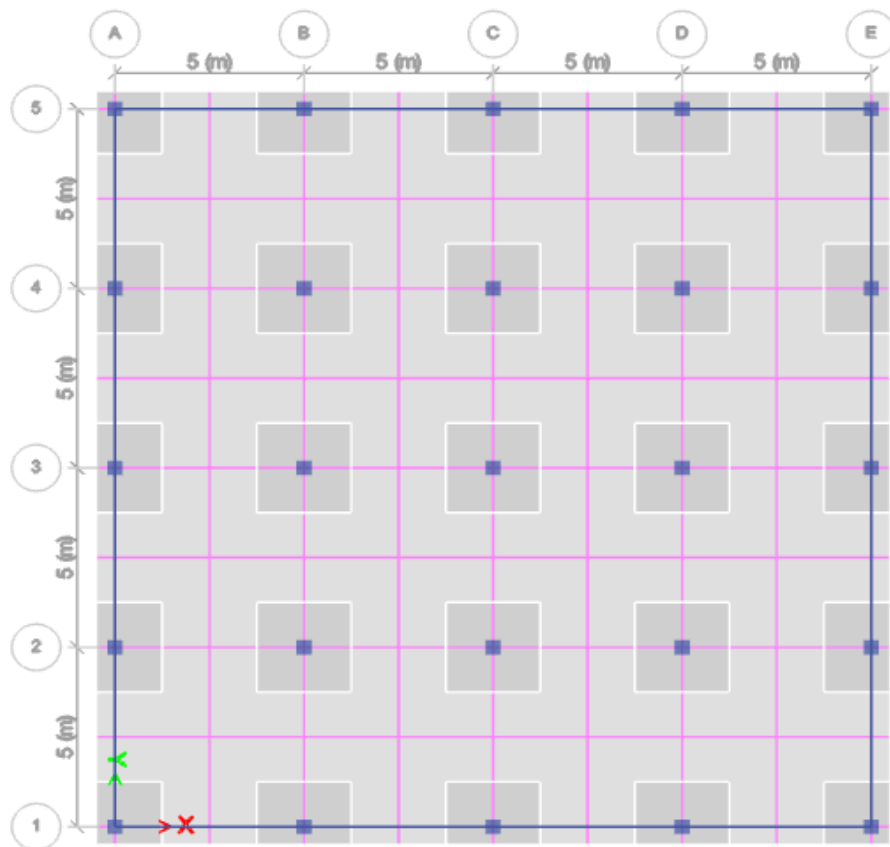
1 Geometric Plan of Flat Slab building with Concealed Beam and Drop Panels
